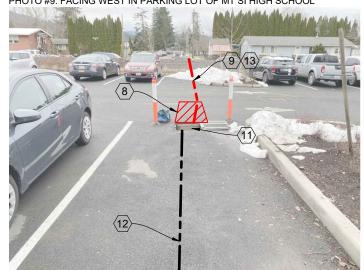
FACING WEST IN PARKING LOT OF MT SI HIGH SCHOOL
